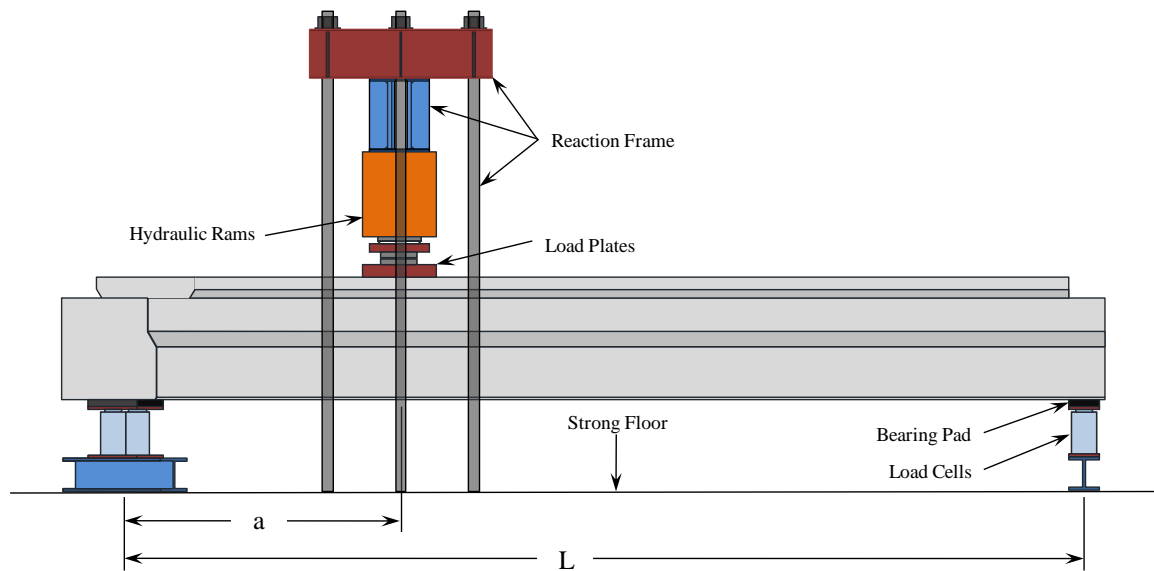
Side Elevation View of test setup for in-house fabricated beams.
